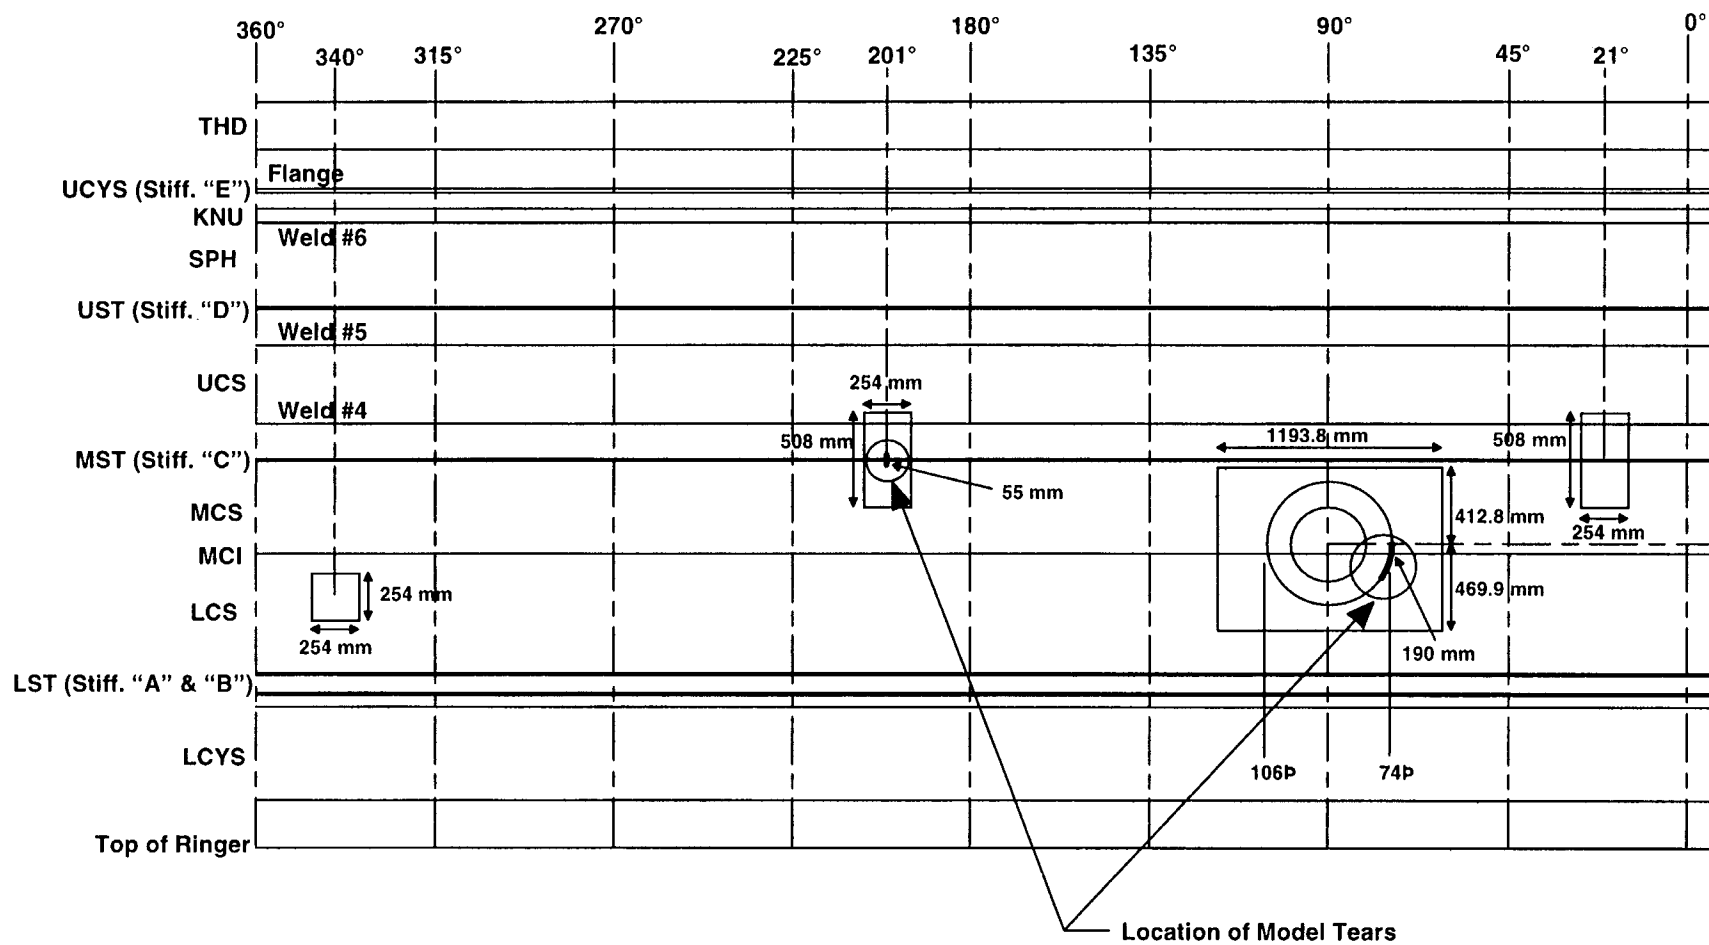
Elevation view of SCV model wall showing sampling locations.
